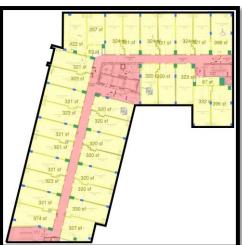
9th story layout Red=hallway, Yellow=rooms
